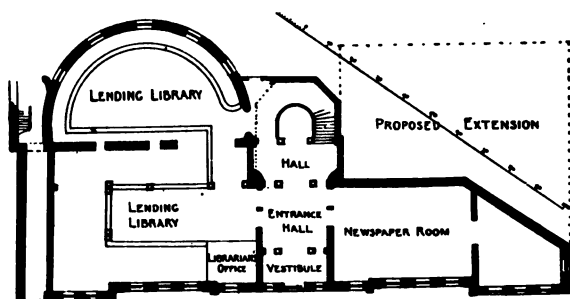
Plan of the ground floor of the Newcastle-upon-Tyne Public Library.
